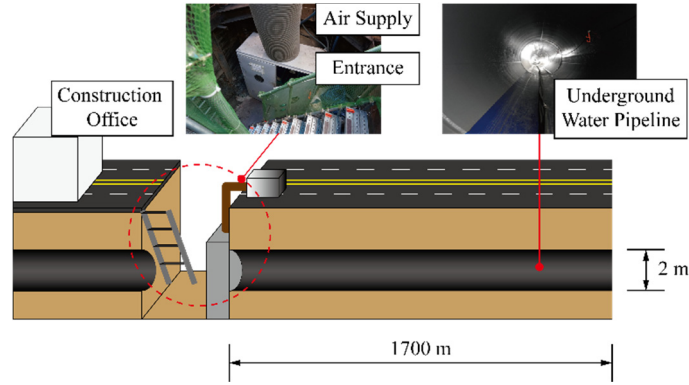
Schematic configuration of first construction site of underground water pipeline
